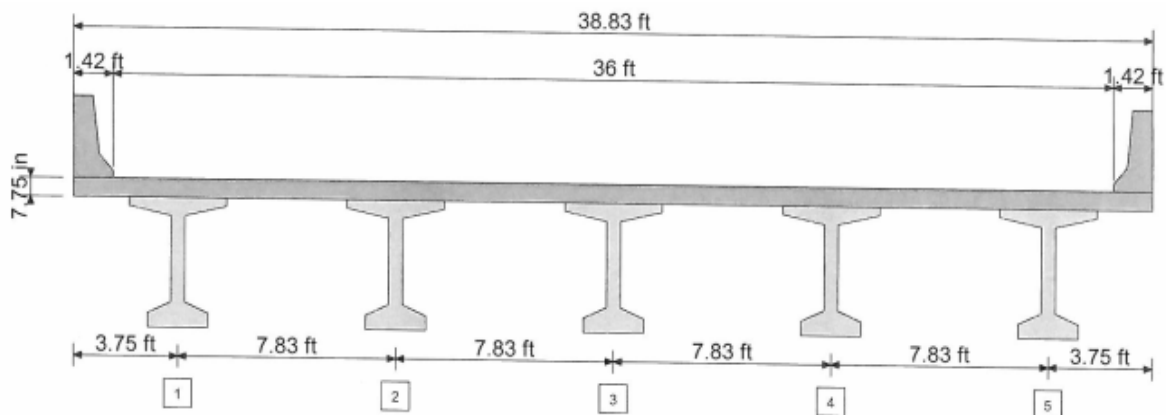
BT-54 (Marshall County) Bridge Transverse Section used for Data Sets
